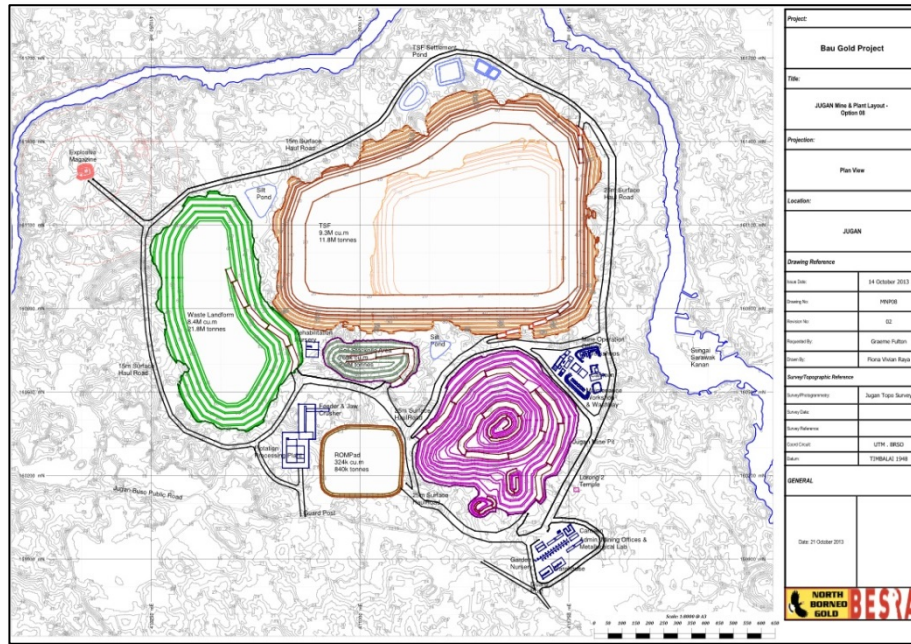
Jugan: Pit, TSF, Waste Landform & Mine Infrastructure
